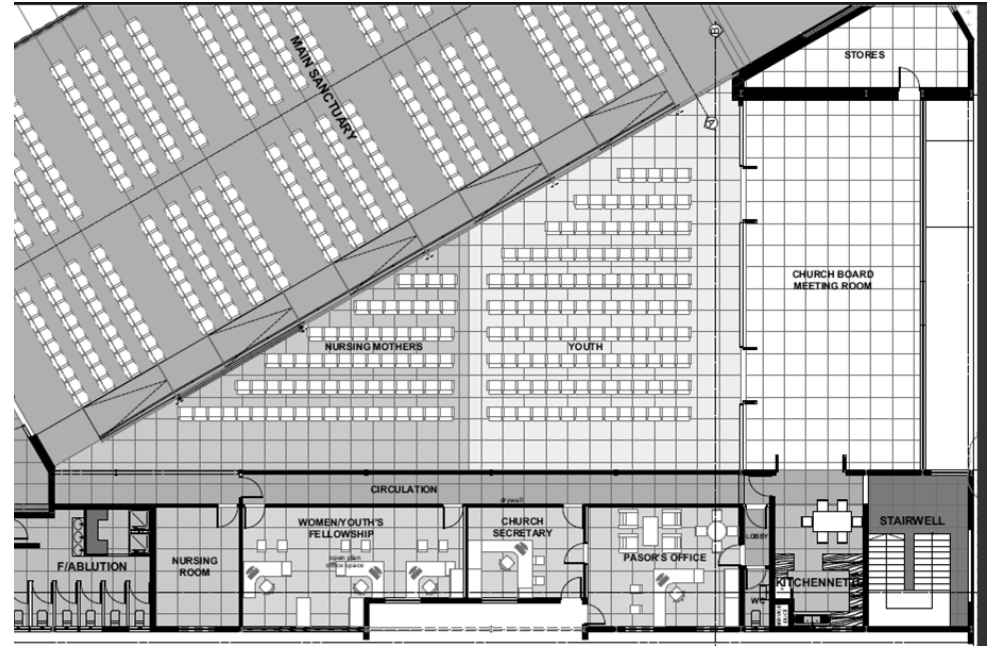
Internal dry walls as a flexible approach. (Author 2022).
